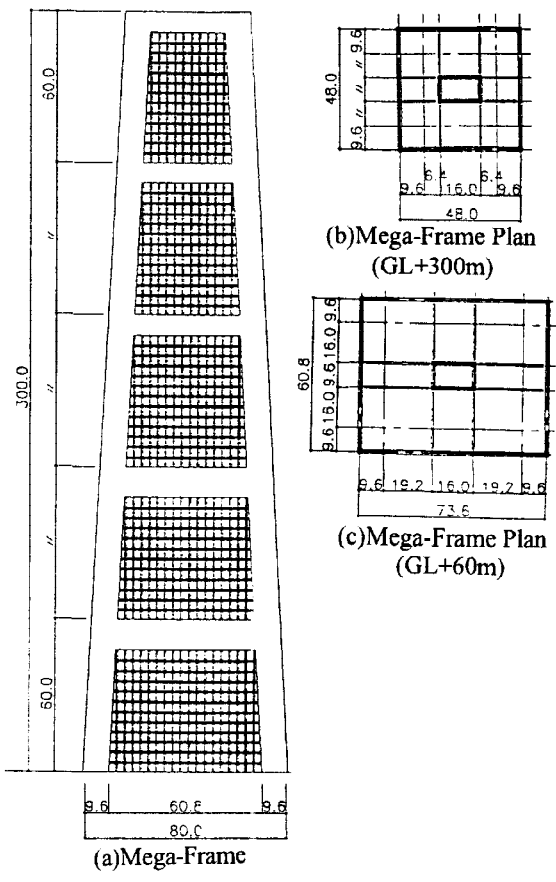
Open frame structure with tapered elevation of 300 meters height (OP300T)
